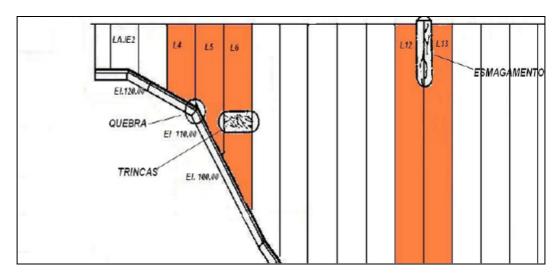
Face slab cracks of Xingó Dam (Souza, 2007)
